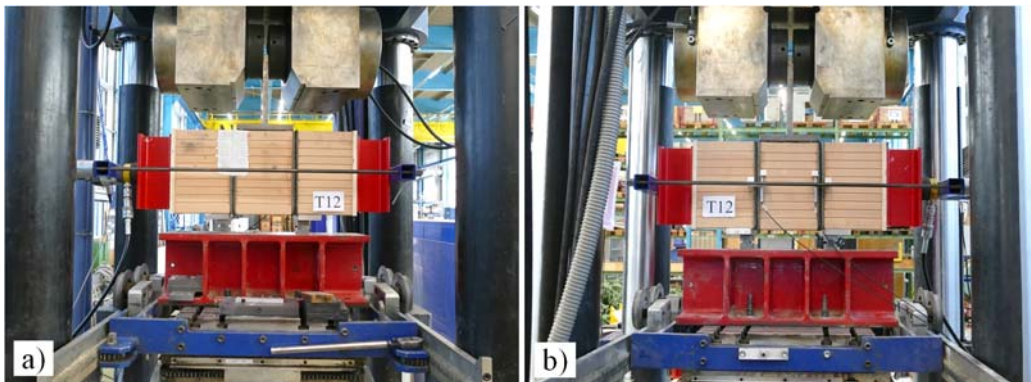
Test set-up: a) South specimen's side; b) North specimen's side
